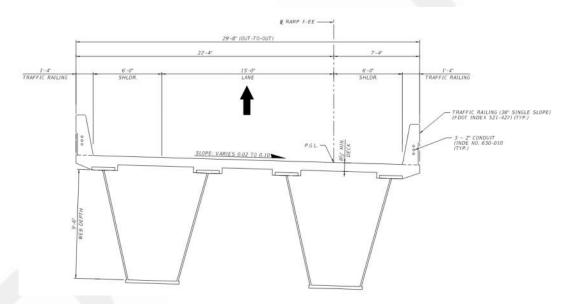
Bridge Typical Section (Bridge No. 11)
